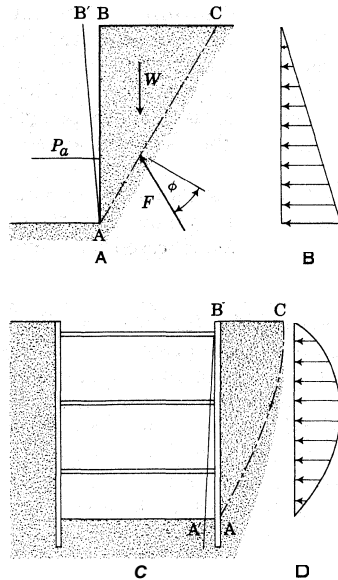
SHEARING RESISTANCE (A) Forces assumed by Coulomb in calculating earth pressure against retaining wall; (B) distribution of pressure against wall; (C) braced cut; (D) distribution of earth pressure against sheeting
